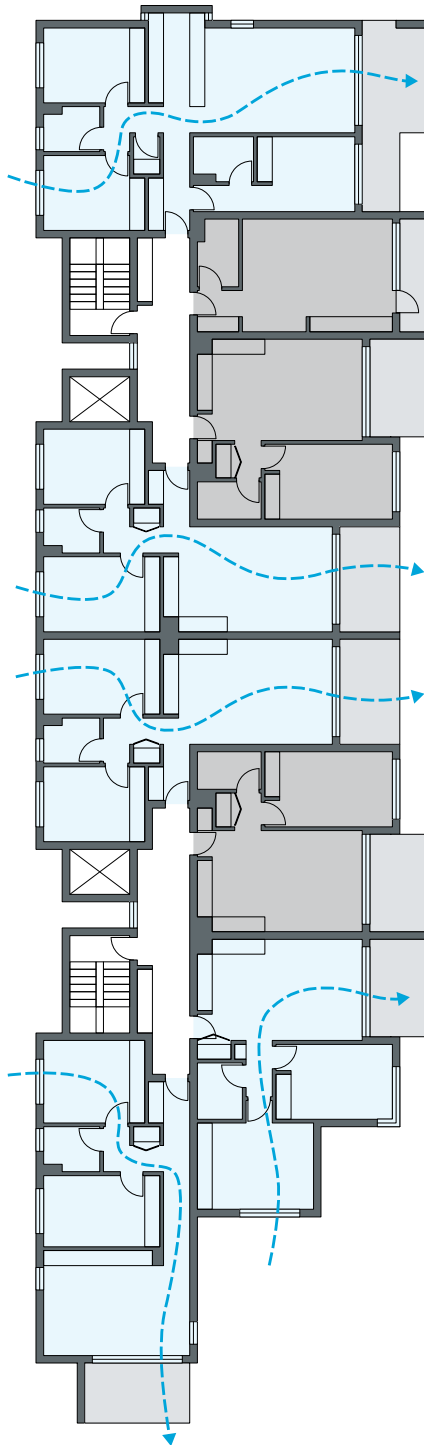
B.8 The floor plan above demonstrates one approach for how five of a total of eight apartments achieve natural cross ventilation
